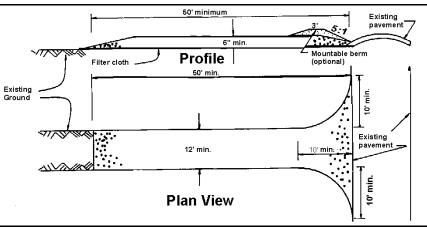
Stabilized construction entrance design (Empire State Chapter, Soil and Water Conservation Society, 1997).
